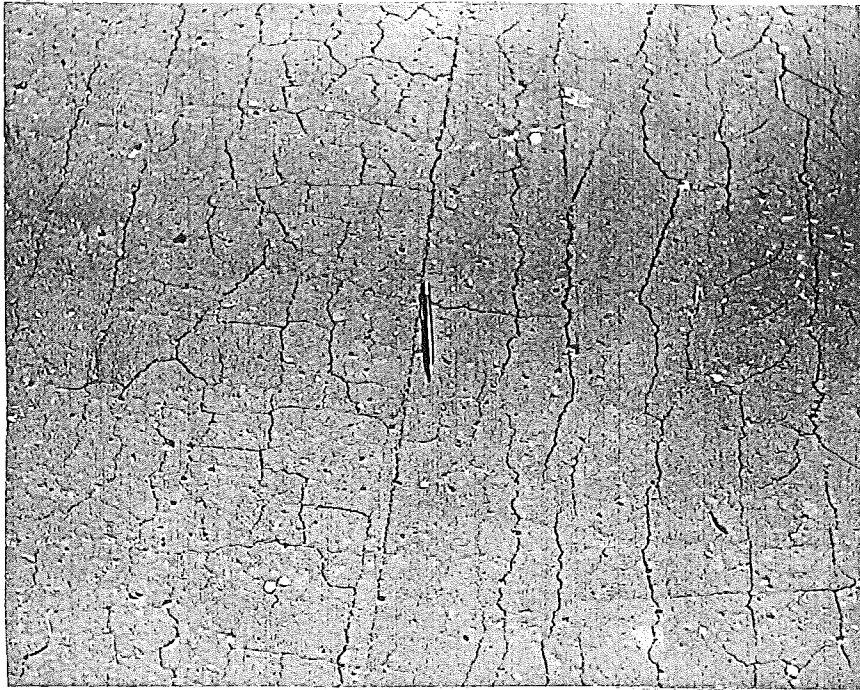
MC-2 section, station 205. Note longitudinal cracking.
